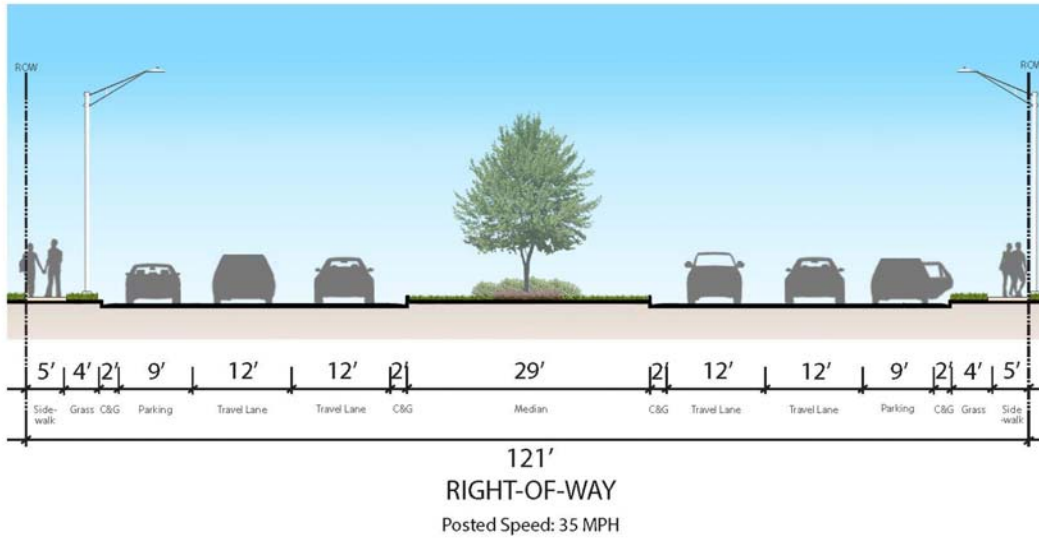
Segment 3 Preferred Short-Term Typical Section (Mebane St to Cassidy St)
